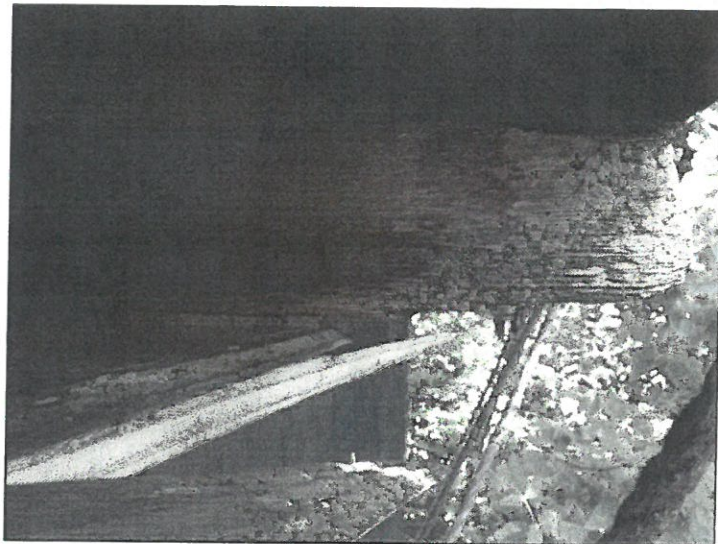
A close-up photo of the underside of the first floor roof overhang showing missing fascia and some soffit boards, rotted rafter tails and loose moulding.
